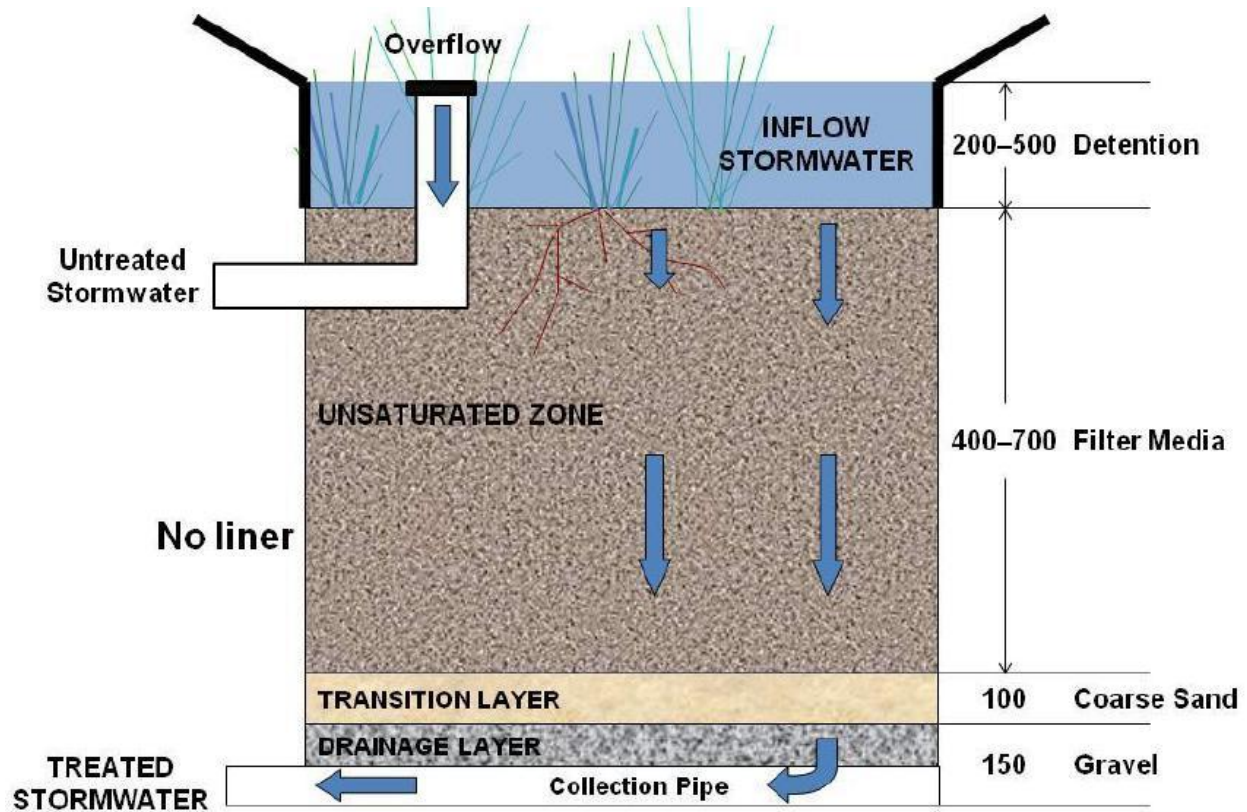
Bioretention system cross section (width). FAWB (2009)
